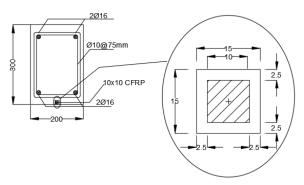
Dimensions, and reinforcement details of RC beams cross-section (all dimensions in mm).
